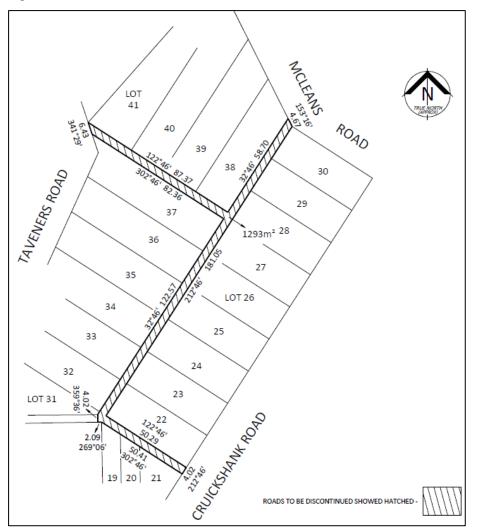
Road Discontinuance Plan off 18 Taveners Road Jumbunna
